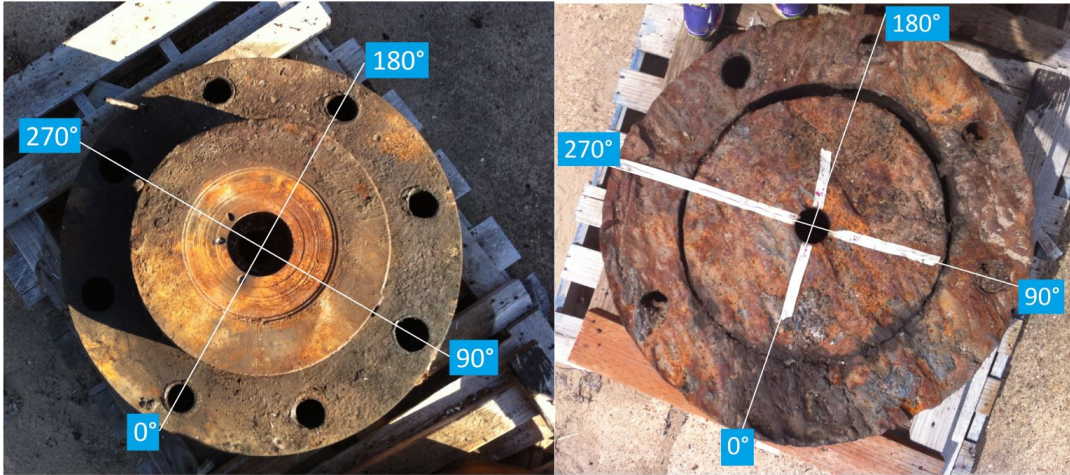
Top view of the out-of-service pins. (Left) Pin Part I, and (right) Pin Part II. The angle references were taken from the bolt hole at 0°.
